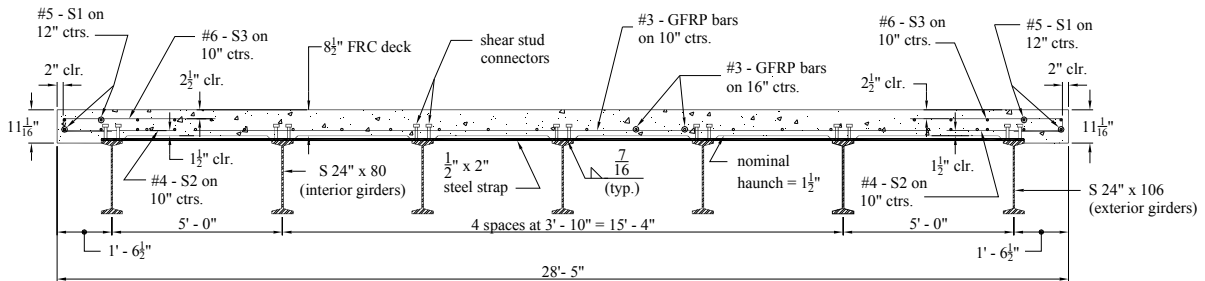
Plan view of the deck system used in the SFD bridge.
